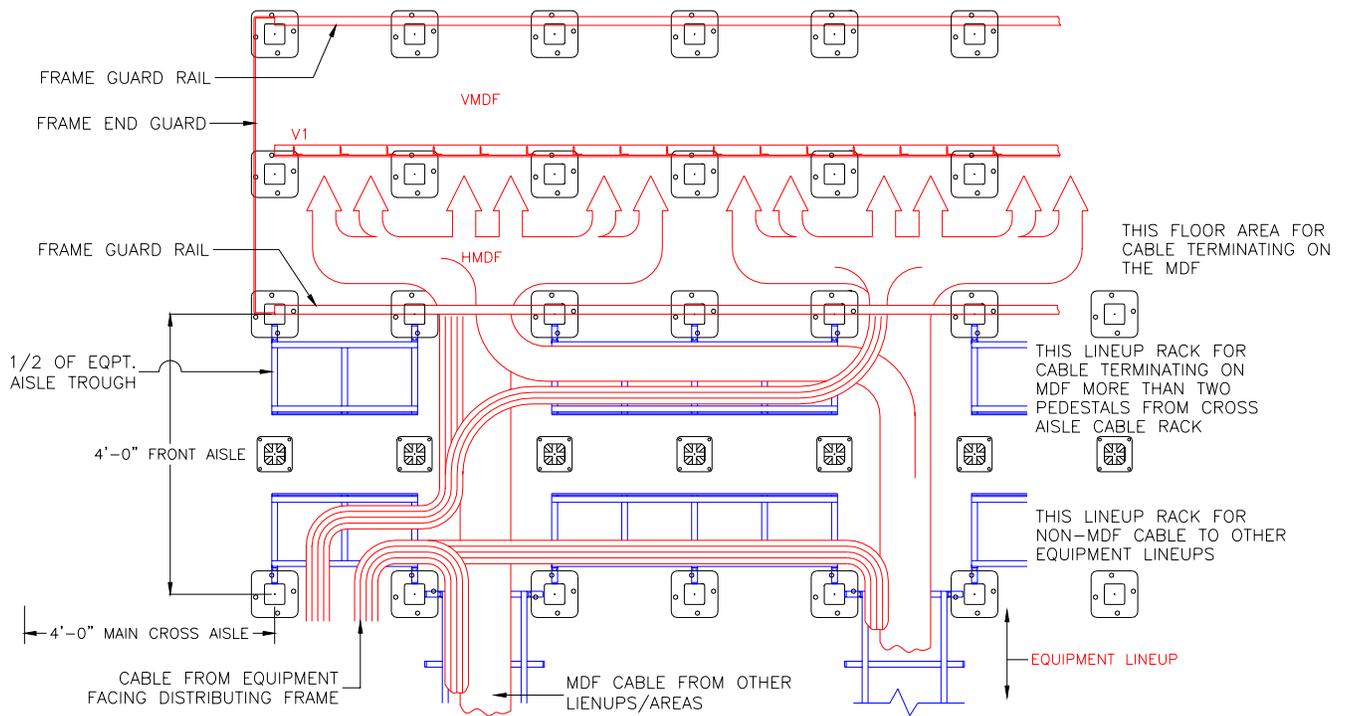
C – Cable Trough And Cabling At Conventional Distributing Frames
